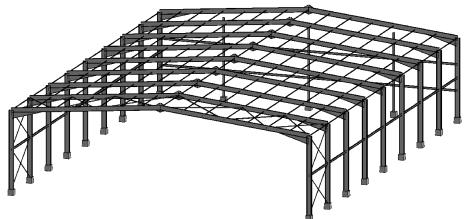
Structural design of hypothetical example 2 (steel framing with solid section)
